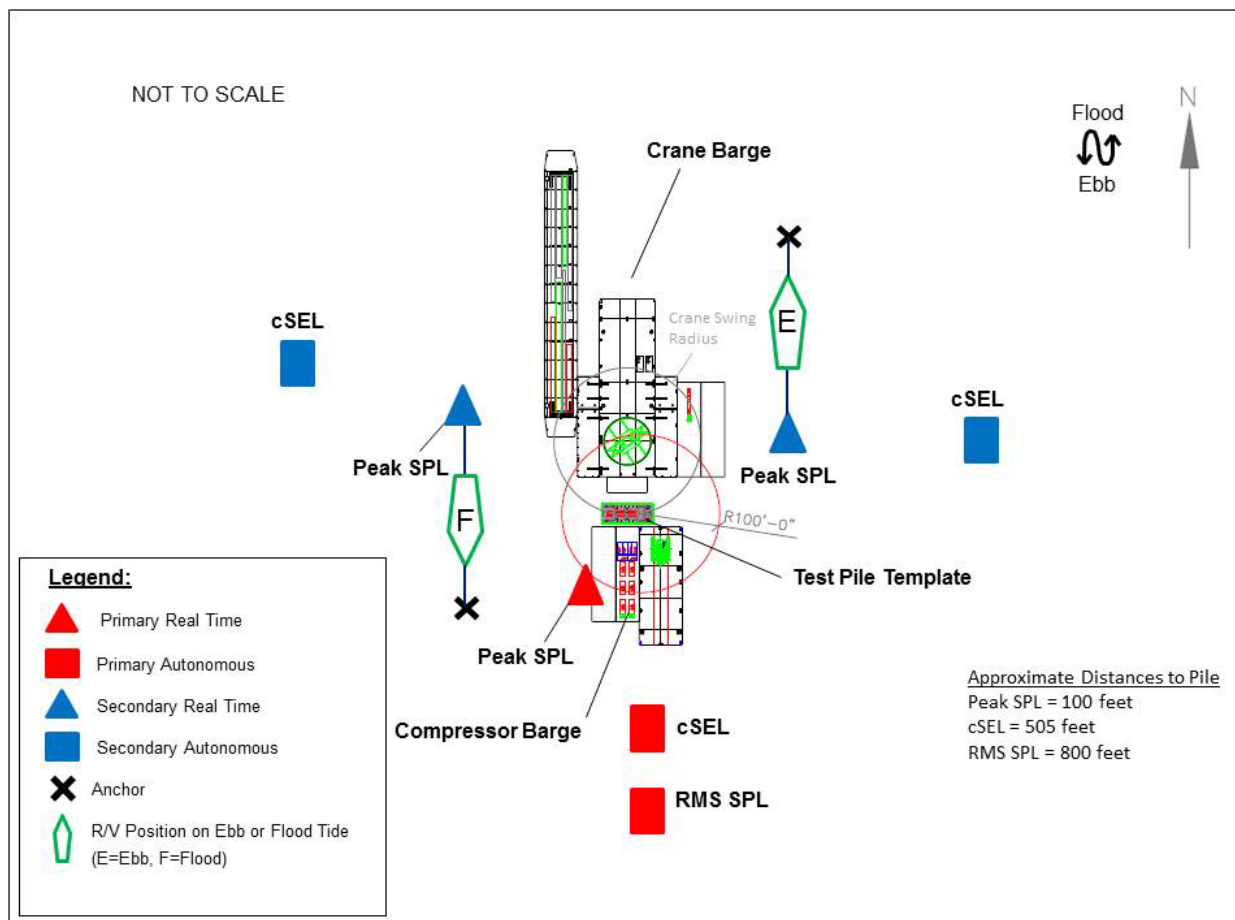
Plan View of a Typical Test Pile Barge Arrangement and Hydrophone Locations for Piles
